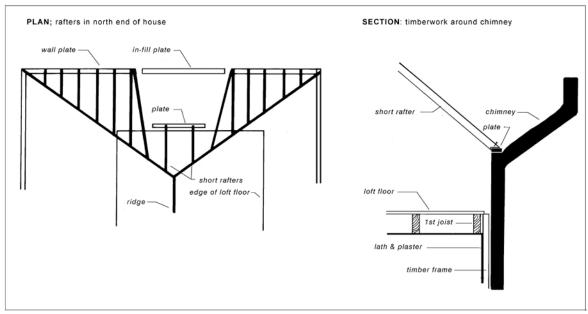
Plan of timber elements in Culla Hill roof and section junction between the central loft and oversize fireplace in northern end of house. R. Luebbers.
